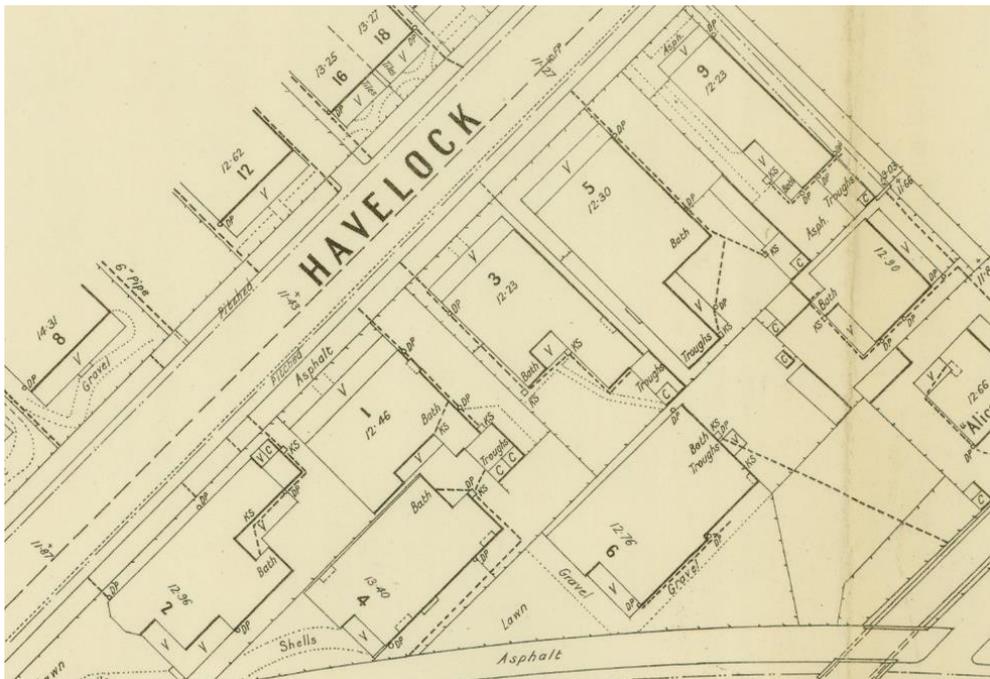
MMBW Detail Plan No. 1375. 1897. Scale 40 feet:1 inch (1:480).
